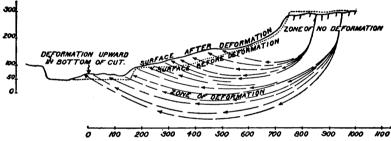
Ideal cross section to illustrate canalward deformation movements.
